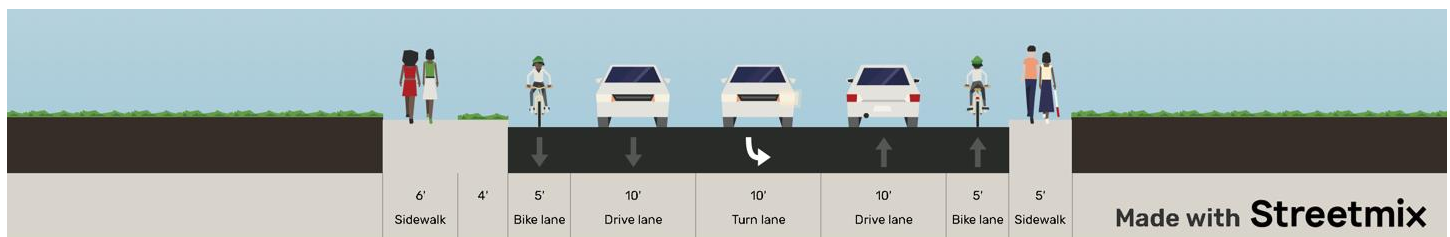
At the intersection of Northeast 72nd Avenue and Northeast 45th Street there are two travel lanes and a dedicated left turn lane, with bike and small mobility lanes and sidewalk facilities on both sides of the street.
